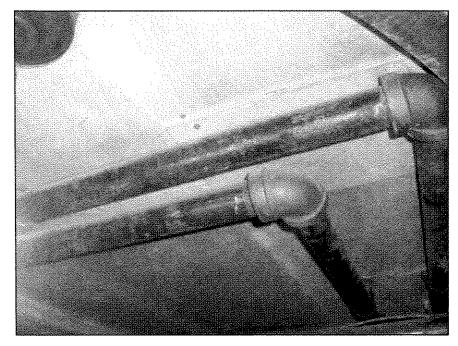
Asbestos containing transite tile, basement 138 Bank Street.
